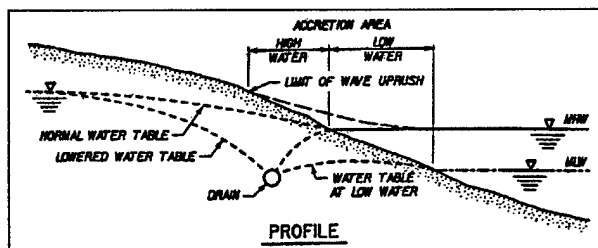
Beach dewatering system--lowered beach water table on beachface
